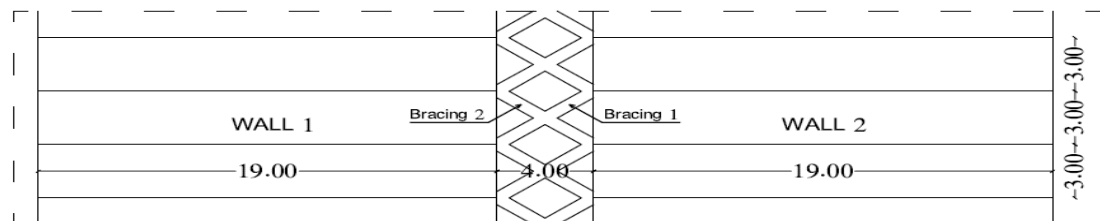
Elevation of coupled shear walls connecting by bracing.
